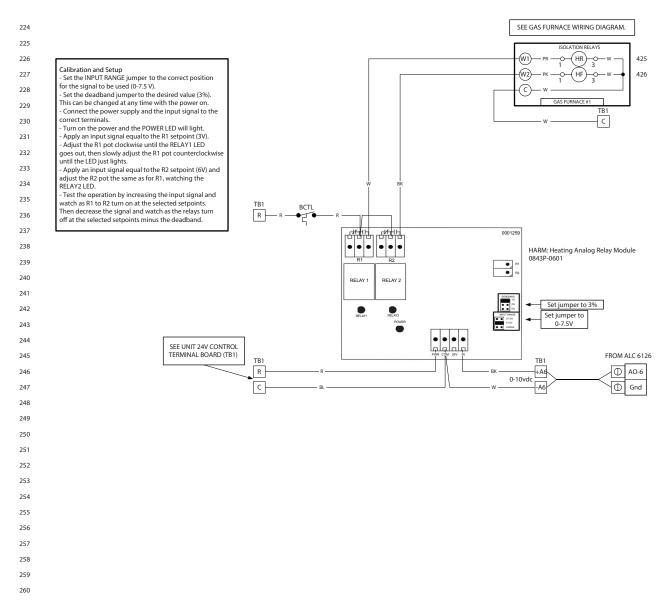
Control Wiring for 2-Stage Gas Furnace
